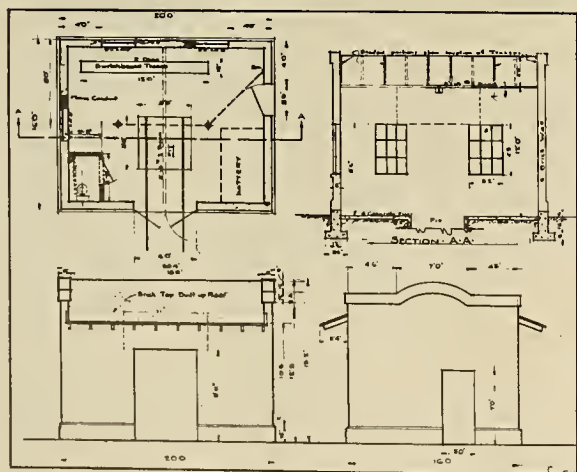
General details of the station building, arranged to house only the switchboard, meters, battery and such equipment, Le Grand substation.
